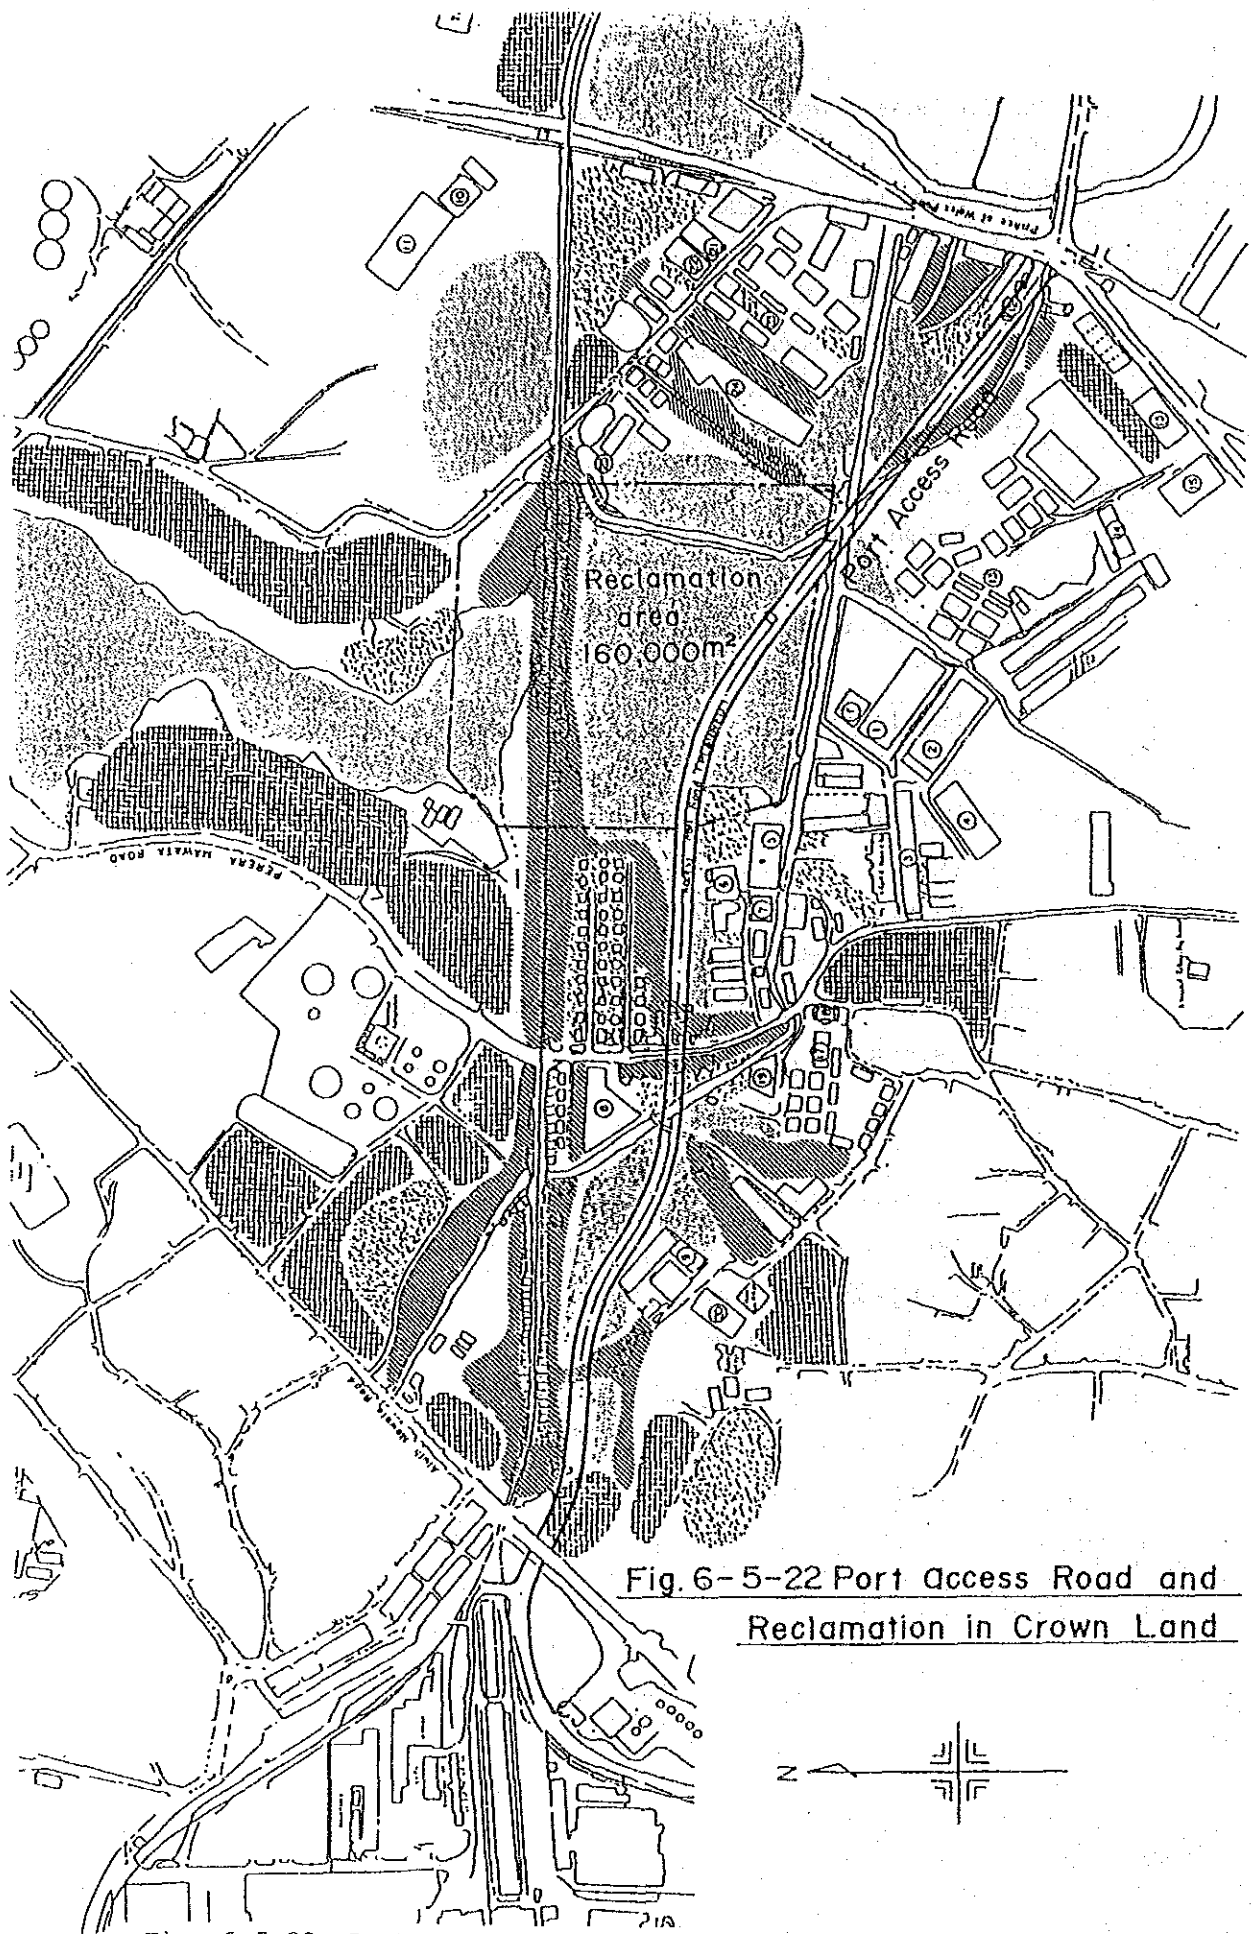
Port Access Road and Reclamation in Crown Land
